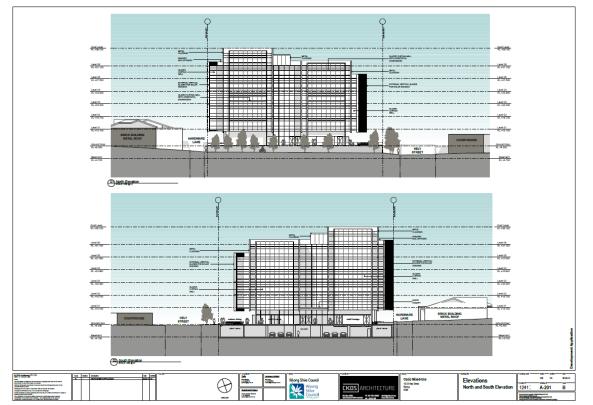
South and north elevations of proposed Stage 1 mixed use commercial and retail development.
